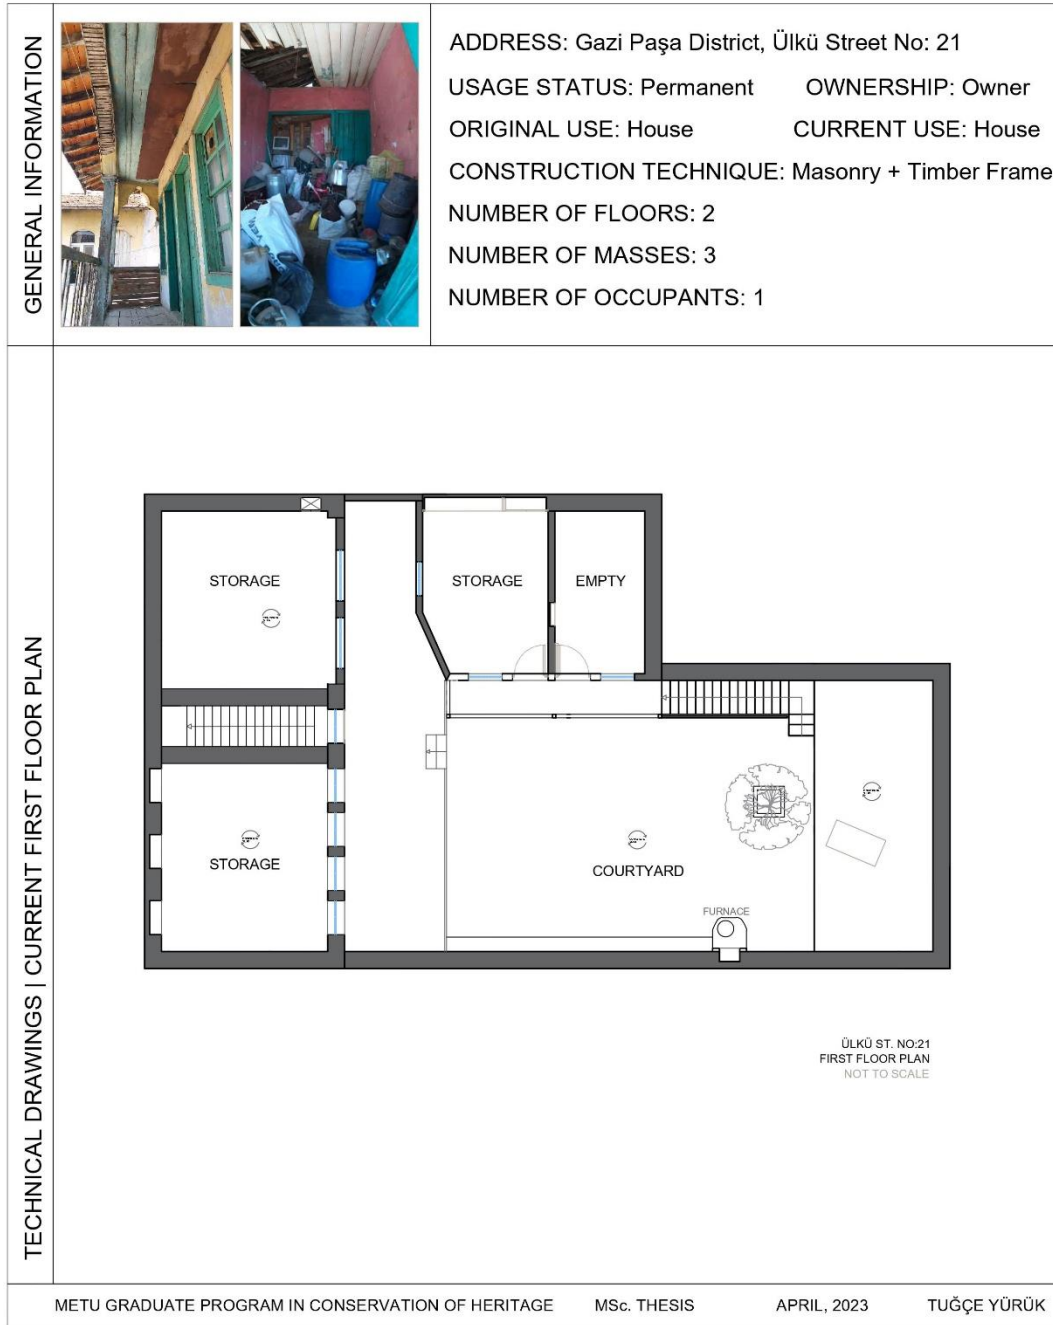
Current first floor plan of Ülkü-21 house (Author, 2023)
